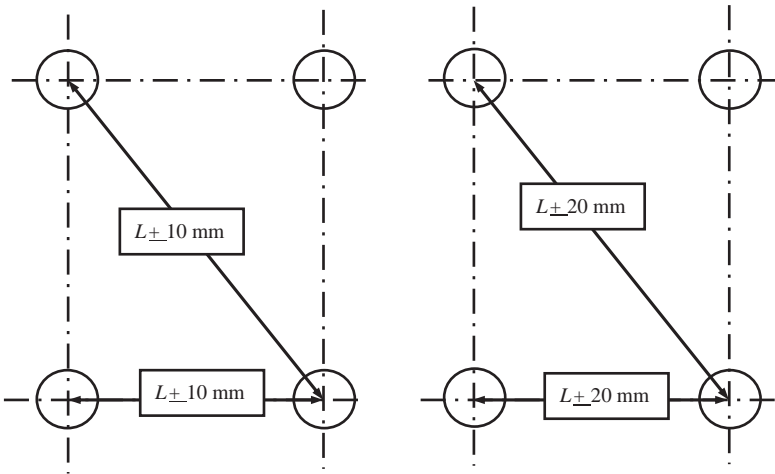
Horizontal tolerance: (A) top elevation for deck and (B) other elevation.
